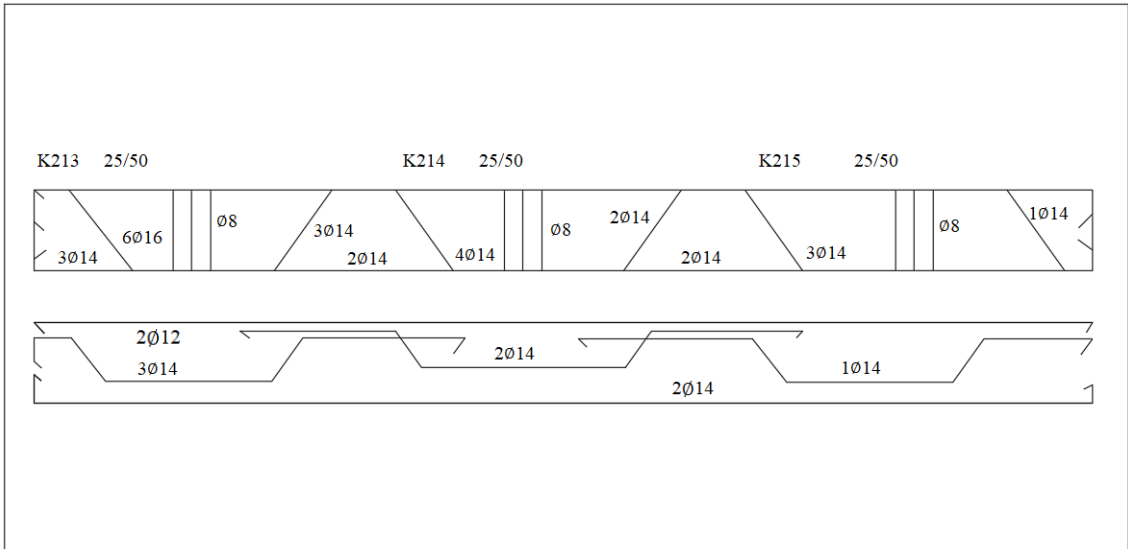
Reinforcement rebar of beams of studied building (K213, K214 and K215)
